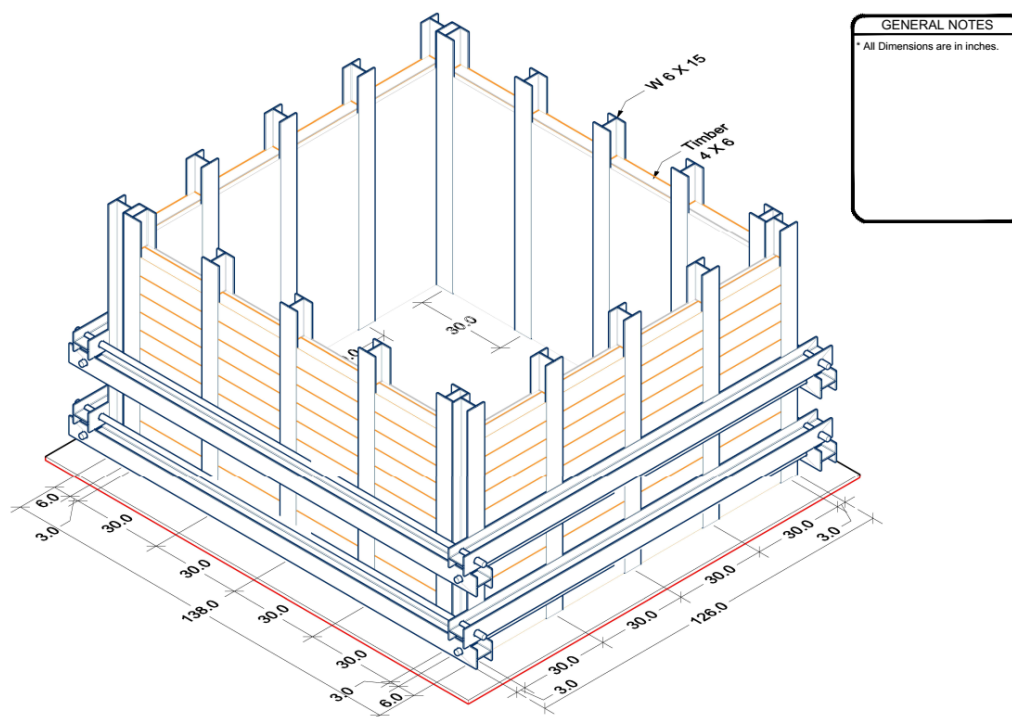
Illustration. Three-dimensional (3-D) schematic of the full-scale pavement/soil testing facility at the University of Nevada Reno.
